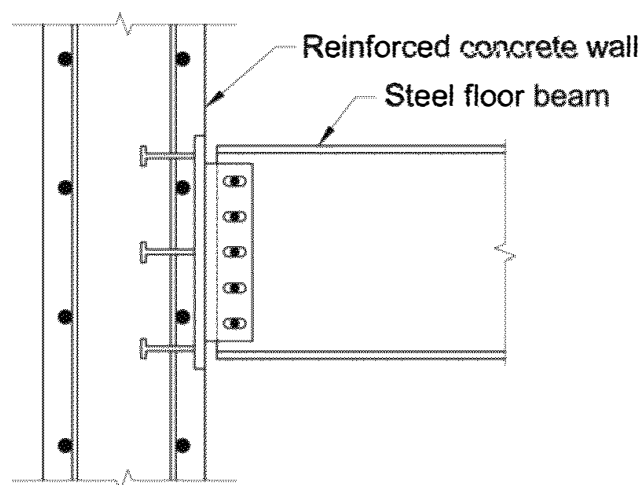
Steel beam-to-reinforced concrete wall gravity load shear connection.
